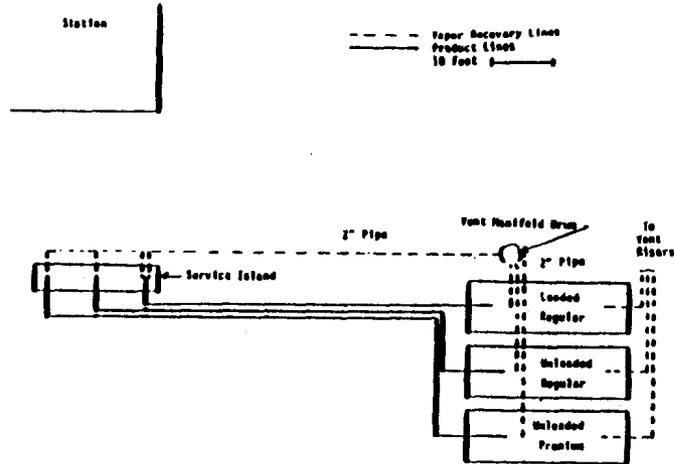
Stage II Underground Piping Layouts for Model Plant 1
